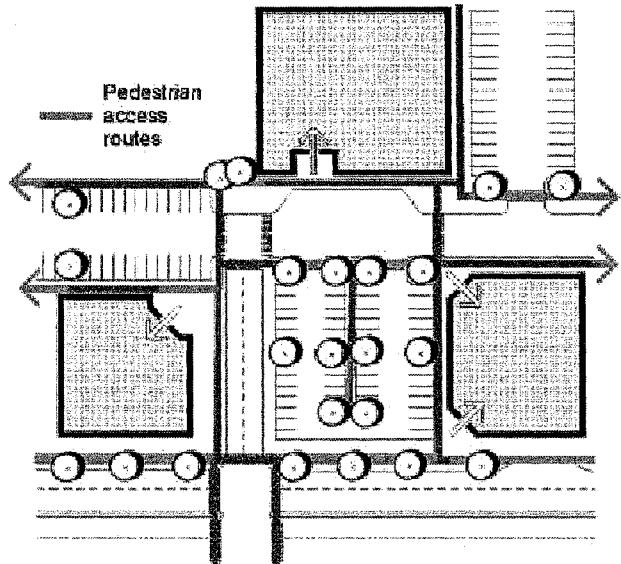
(C). Good internal pedestrian circulation. Note connections from the street, between buildings and through parking lots.
